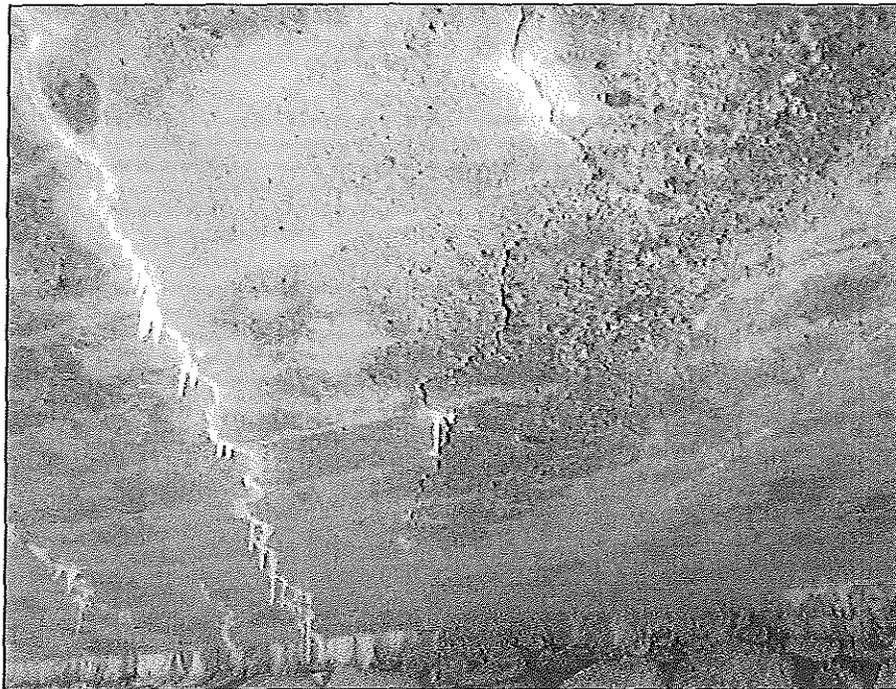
Full span crack in deck 14 ft west of utility pipe
